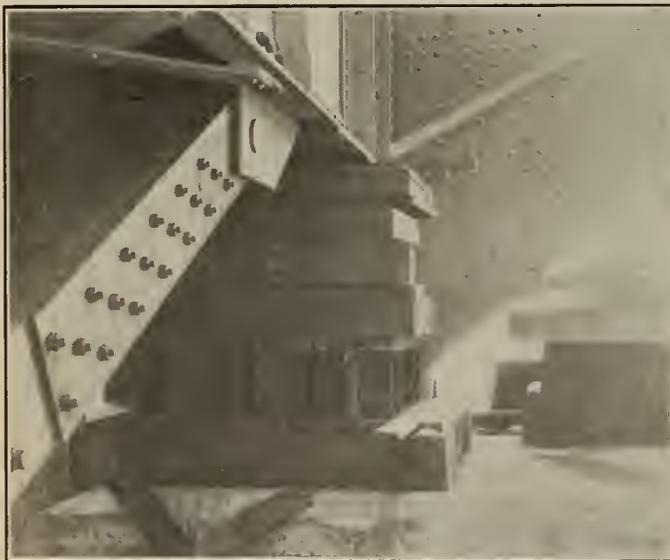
Main Span, South Side—Arrangement of Shims and Blocking at Anchor Pier.
